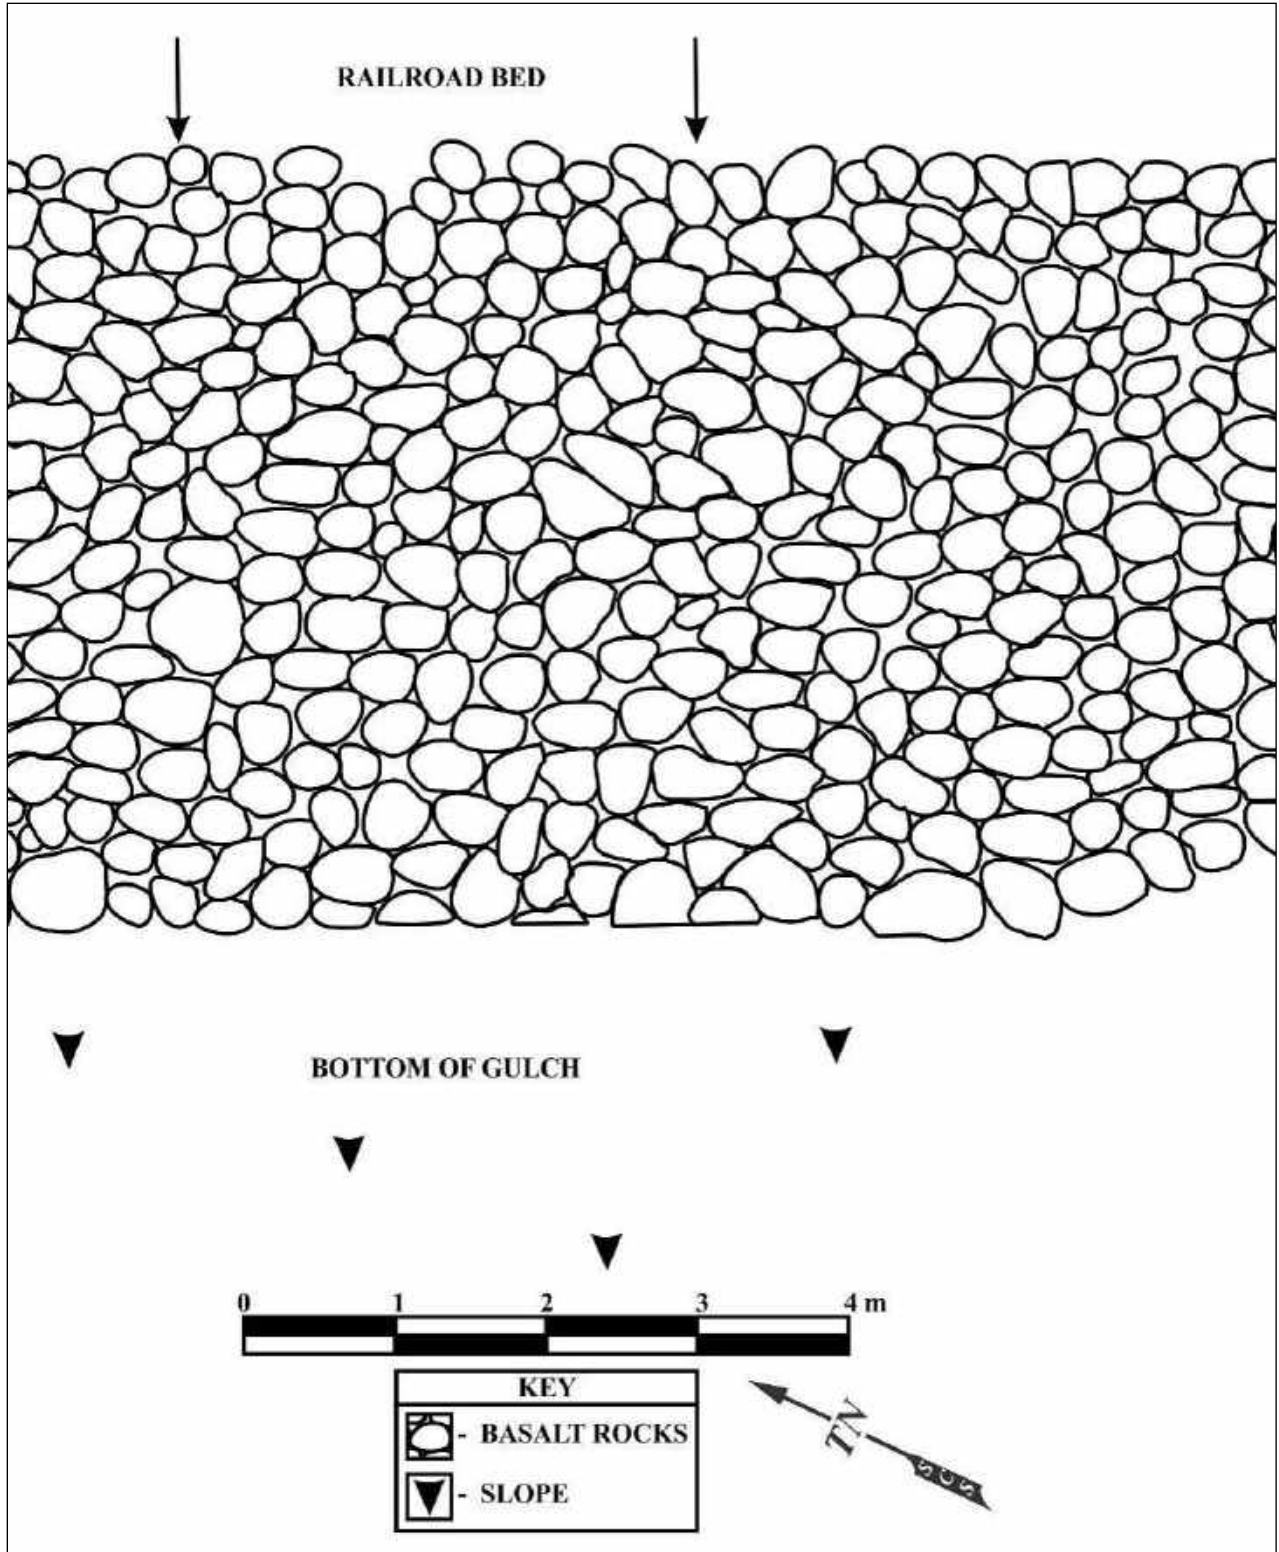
Site 30592 Railroad Berm Retaining Wall Profile.
